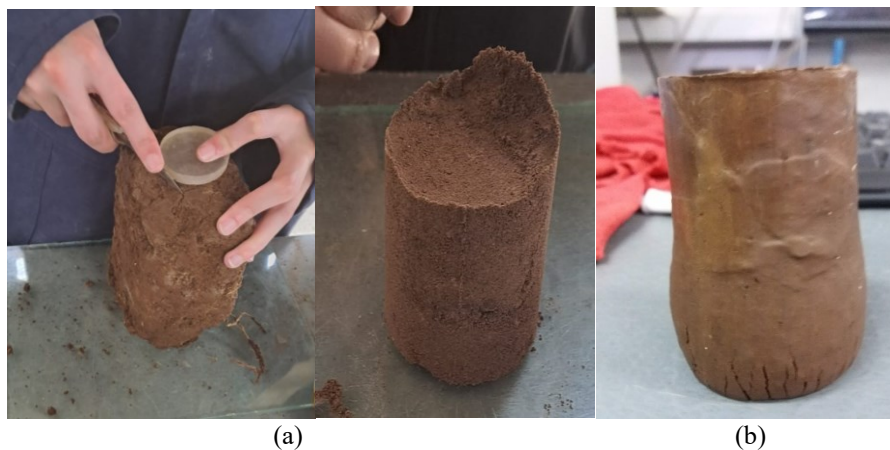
(a) Process to perform a cylindrical unaltered specimen, (b) Sample after testing.
